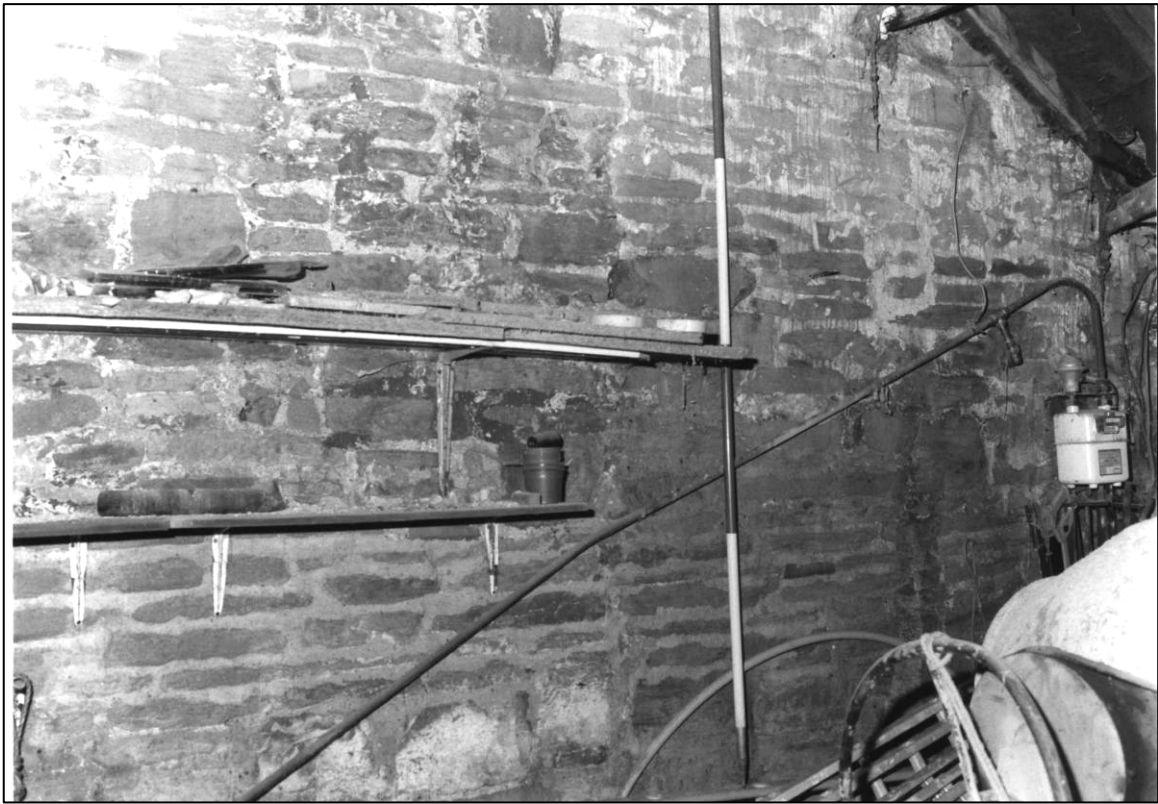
Barn Cottage range, N part, N gable from within garage, looking SE (photo 12/8).
